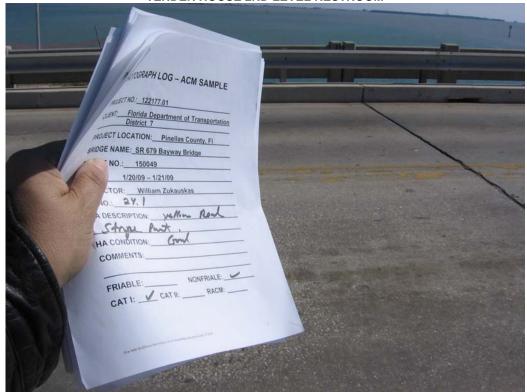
01/21/09 - SAMPLE 24.1 - HA 24 YELLOW PAINT ROAD STRIPES
